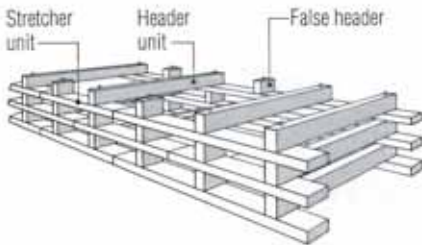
COMPONENTS AND ARRANGEMENT OF CRIB WALL
